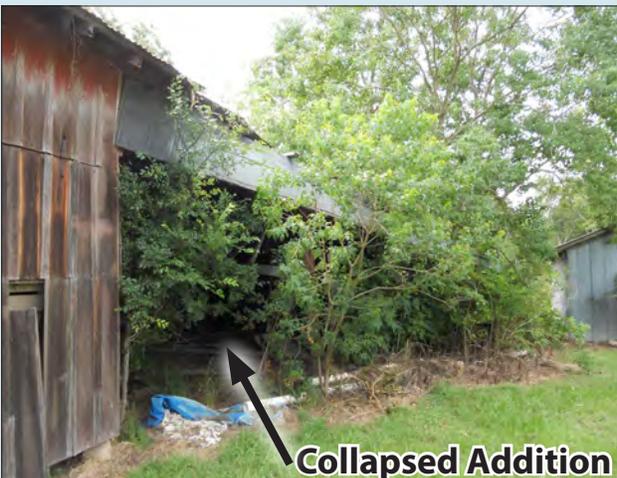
Collapsed addition. Remove if possible, to stop drag on main building.
